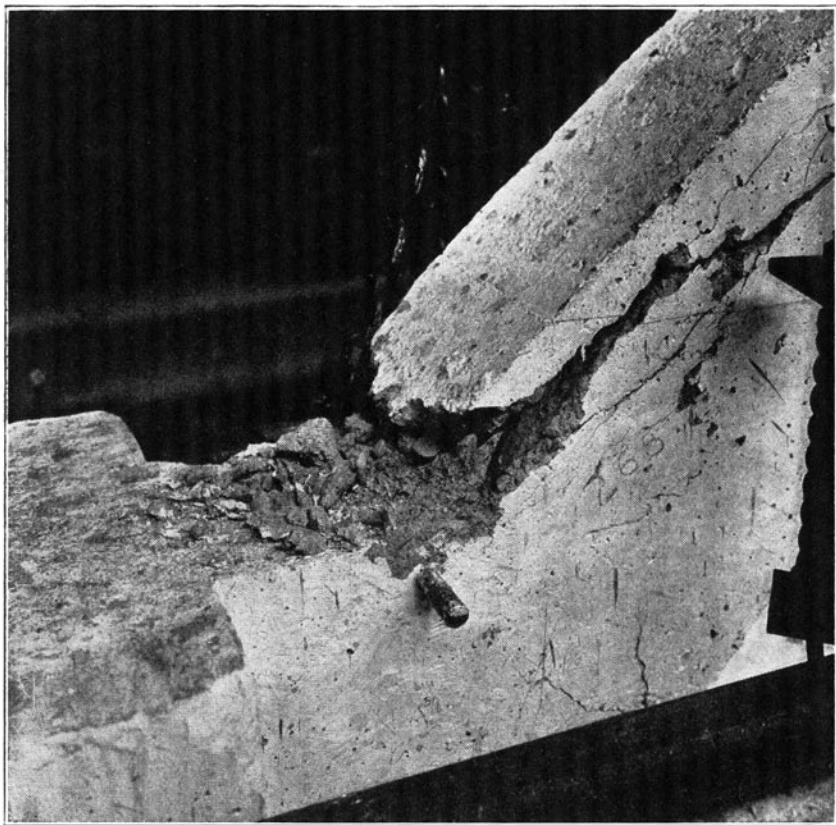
FAILURE OF ARCH 26-8 AT NORTH SPRINGING DUE TO
